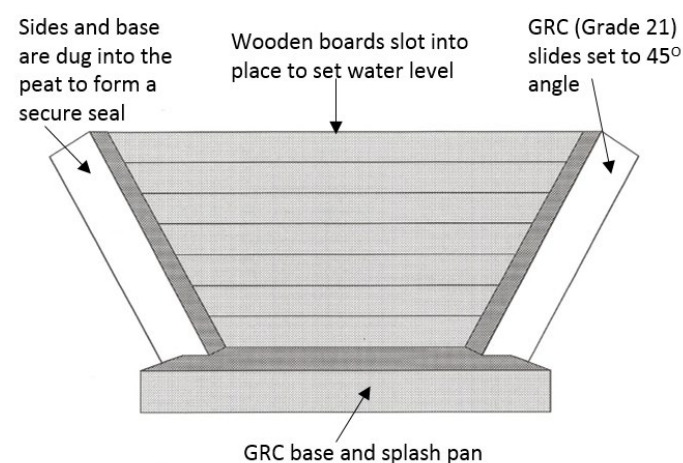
Plank sluices can be purchased ready made. They are constructed from glass reinforced concrete and have horizontal wooden planks that can be added or taken away to set the desired water level.
